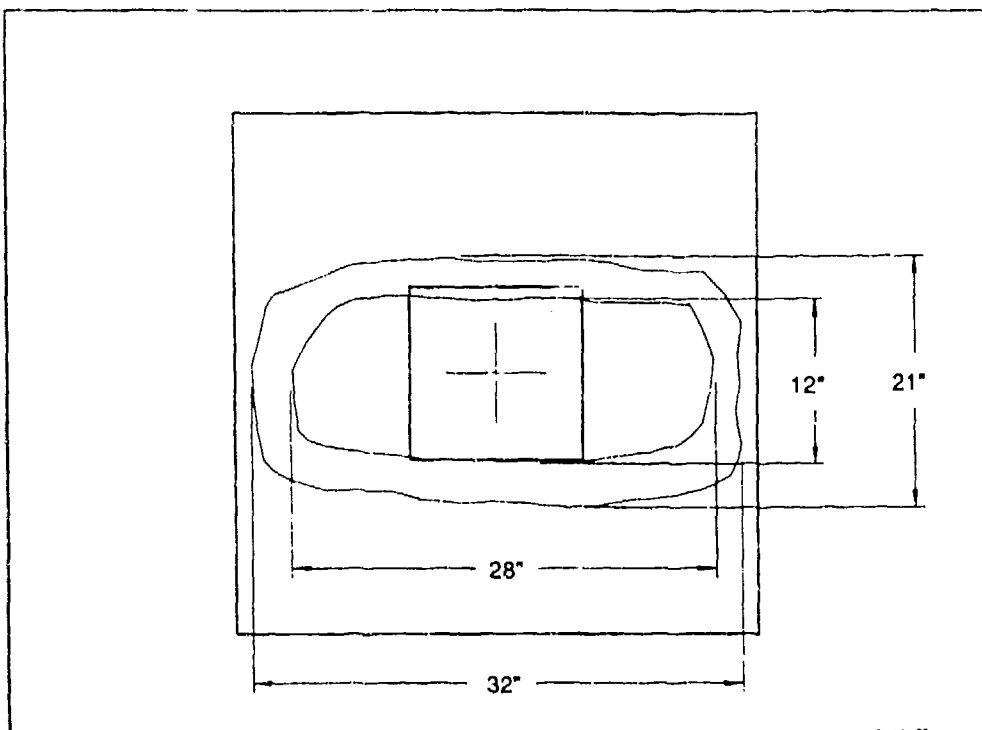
A Schematic of Test 11 Wall Damage (Type A, 2.4-Pound Cased Charge).
